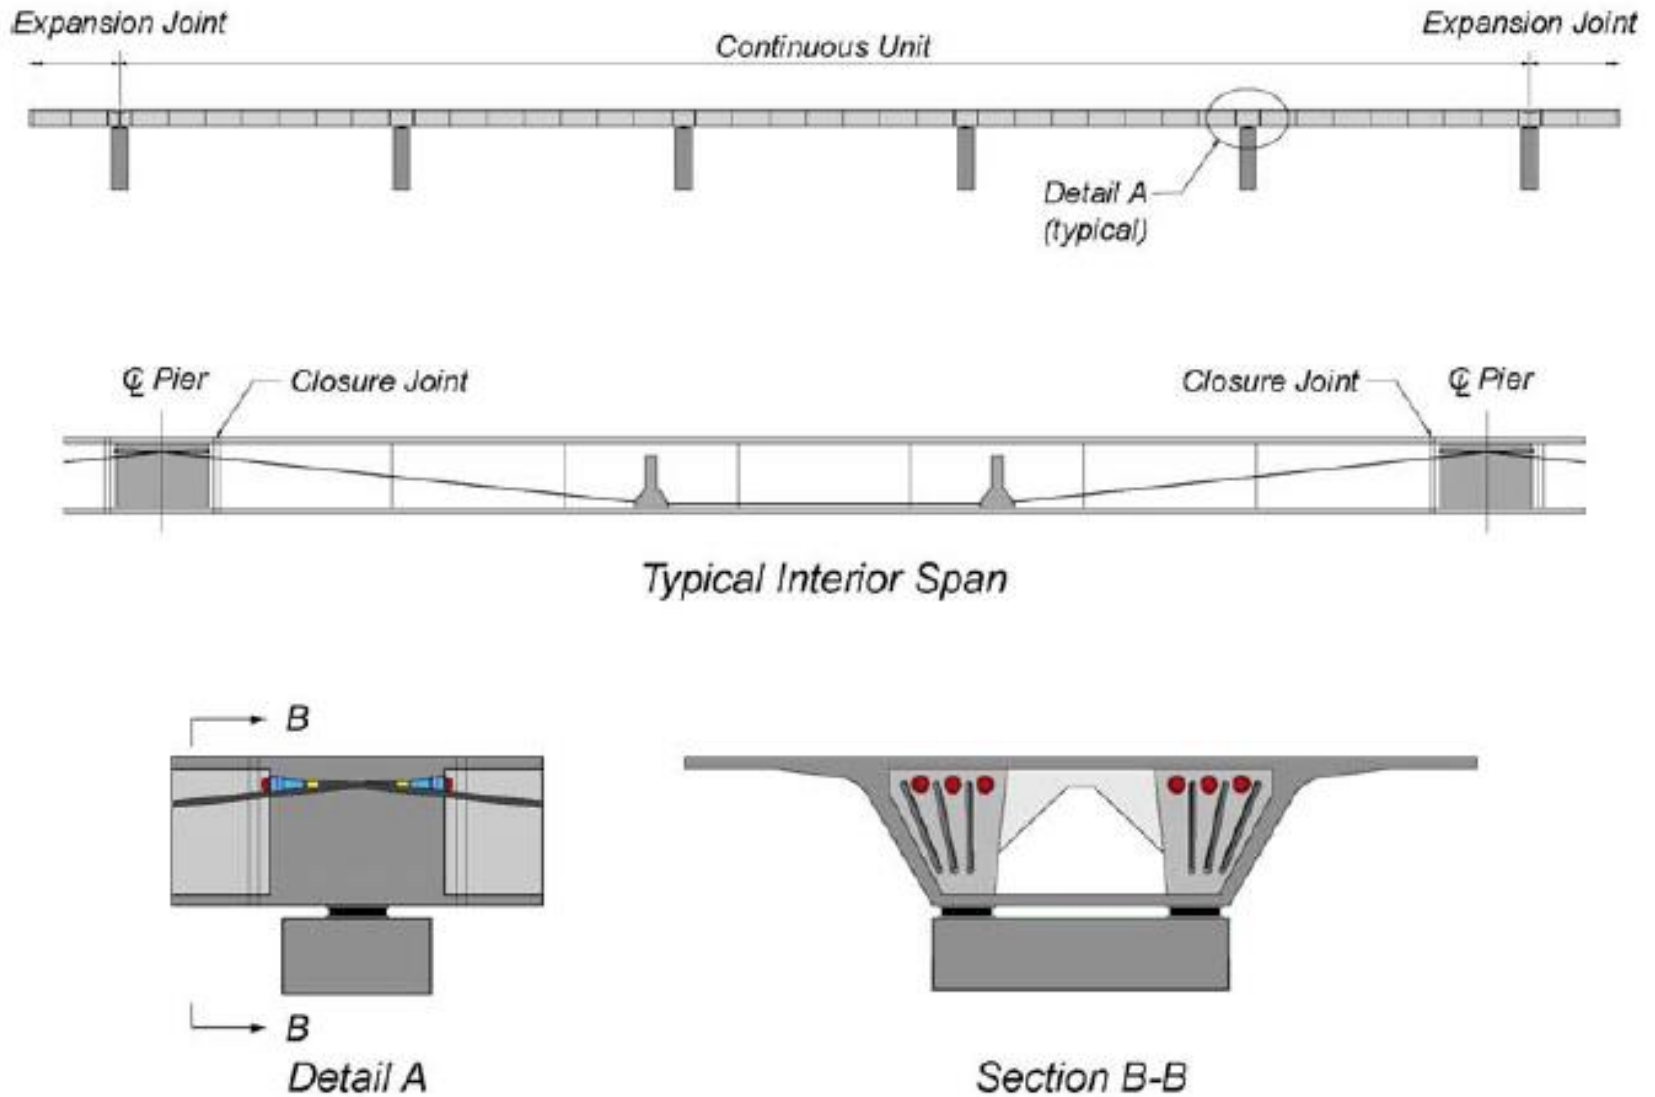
Interior Span Post-Tensioning for Span-By-Span Construction.
